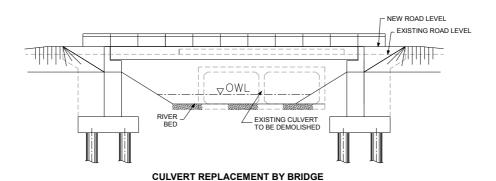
REPLACEMENT OF EXISTING BOX CULVERT WITH 1-SPAN BRIDGE
